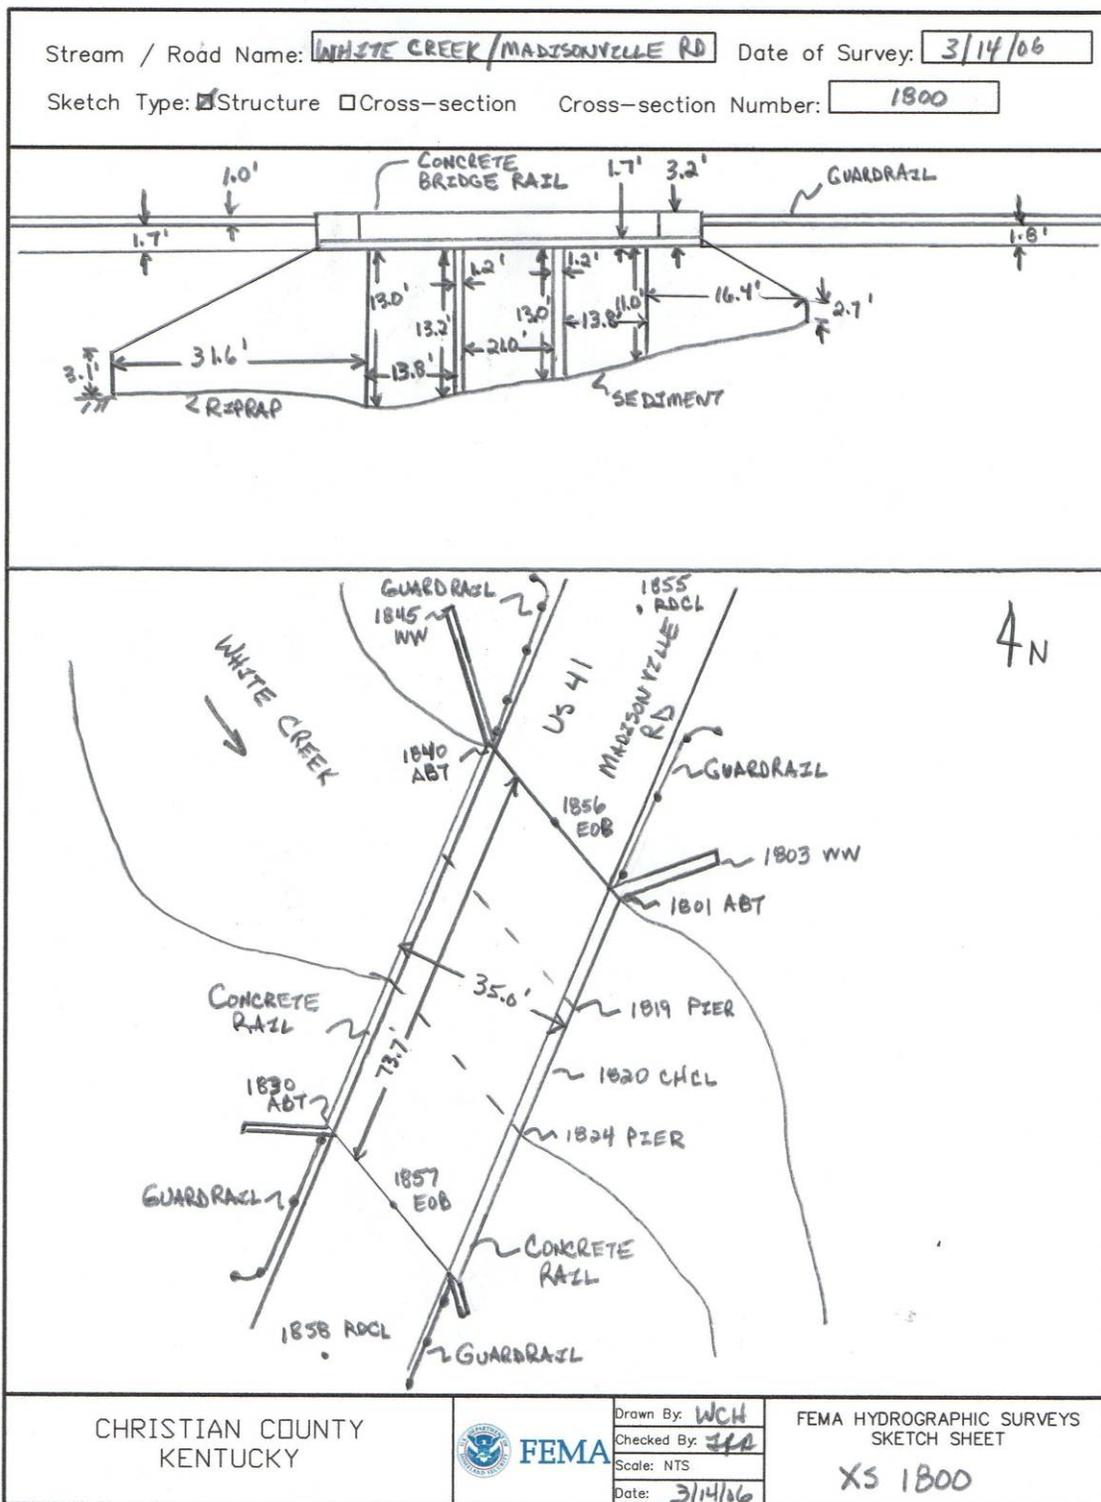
Typical Bridge Sketch: White Creek WHI-1800
